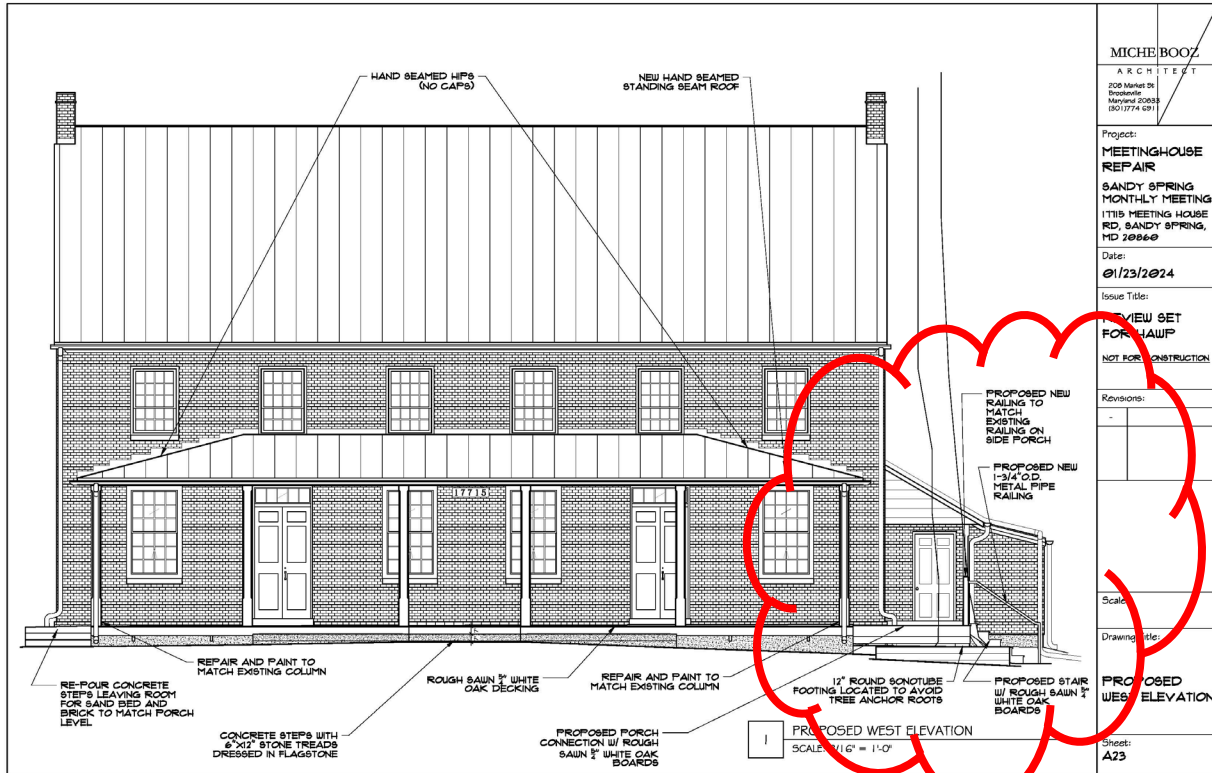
The proposed connecting deck and new stair and railing are clouded in red.
